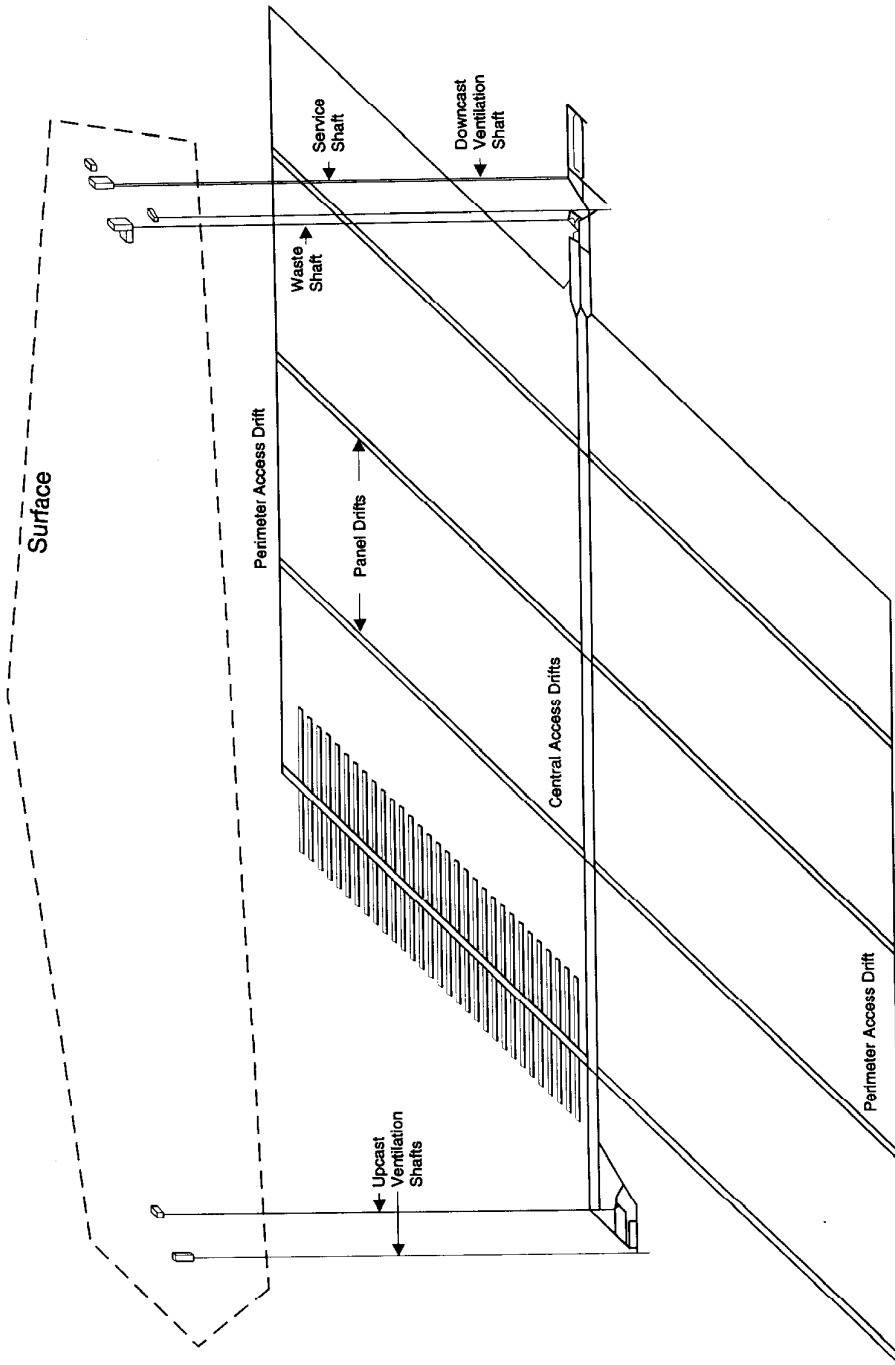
The hypothetical vault layout showing the location of the up and downcast shafts, access and panel drifts, and the disposal rooms (Simmons and Baumgartner 1994)
